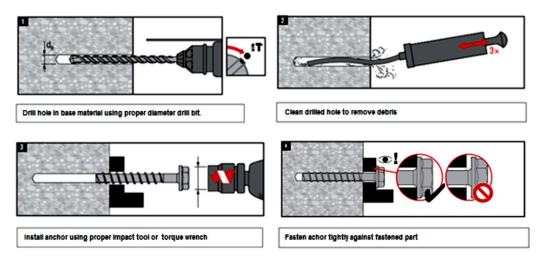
INSTALLATION INSTRUCTIONS—HILTI KH-EZ, KH-EZ CRC AND KH-EZ SS316
